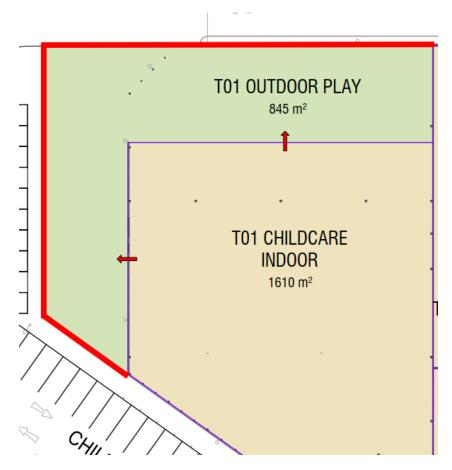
Recommended Acoustic Treatment for the proposed Outdoor Play Area
